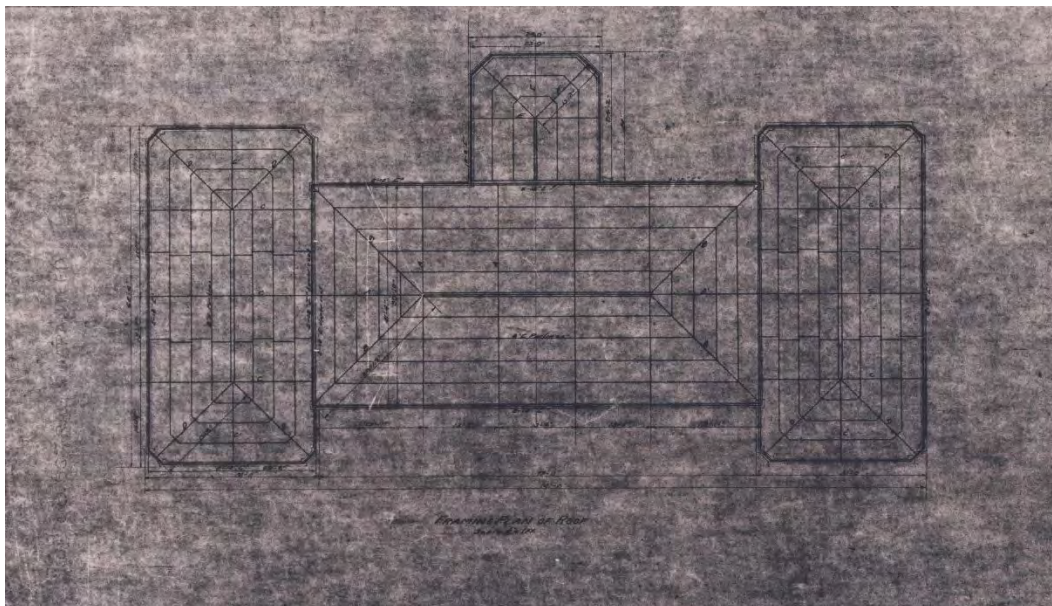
Roof (Truss) Framing Plan (1907 Plans)
